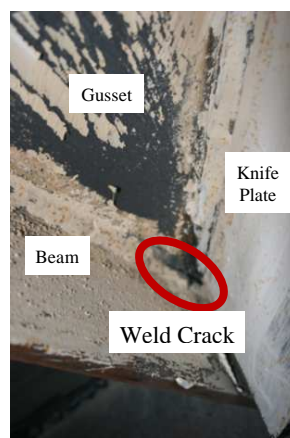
W2 in South Gusset-to-Beam Weld
